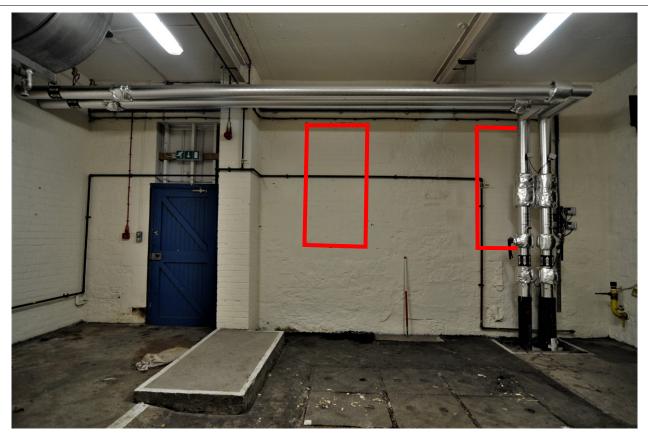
Ground floor Unit 1 workshop/storage showing two brick-blocked windows
